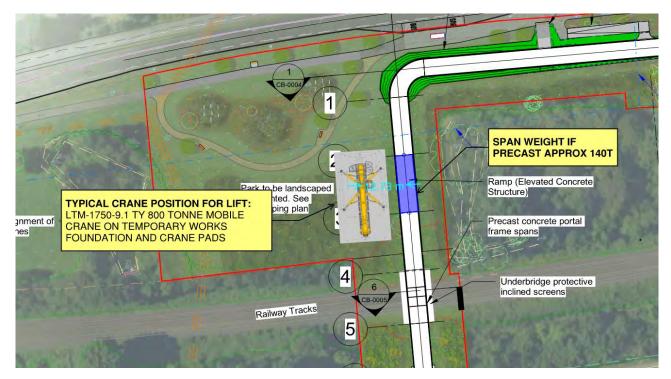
Proposed methodology for erection of north elevated ramp superstructure for precast deck option
